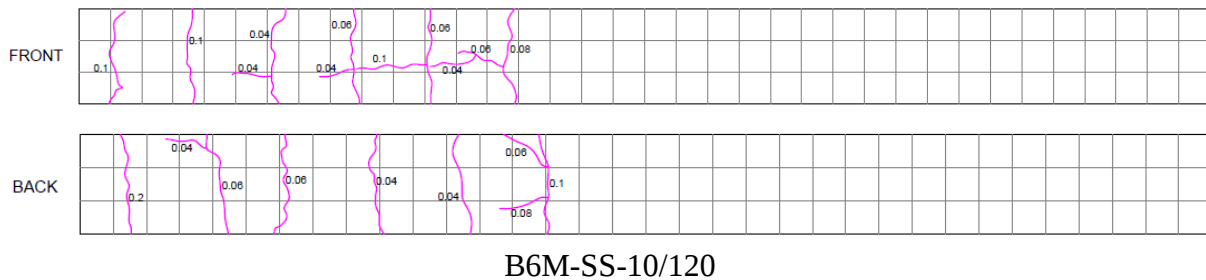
Corrosion cracks frequency of D10, 120 mm beams mildly corroded
